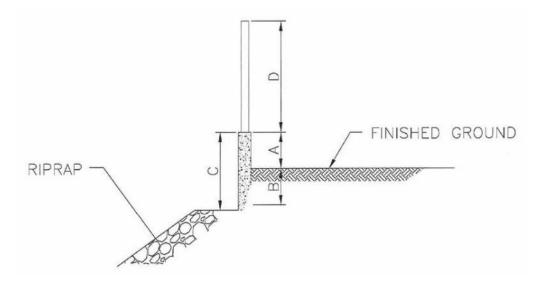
Cross section of Canterbury Lane Dike floodwall (McElhanney, 2006a)
